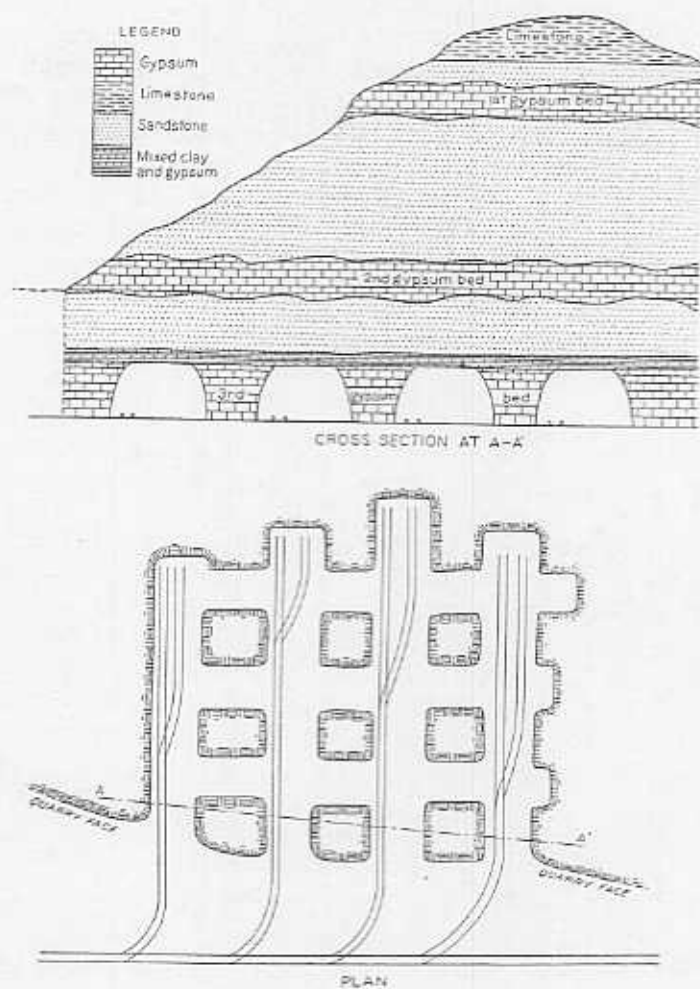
Cross section and plan of room-and-pillar workings, Blue Diamond Corporation. Ltd., Arden, Nev.
